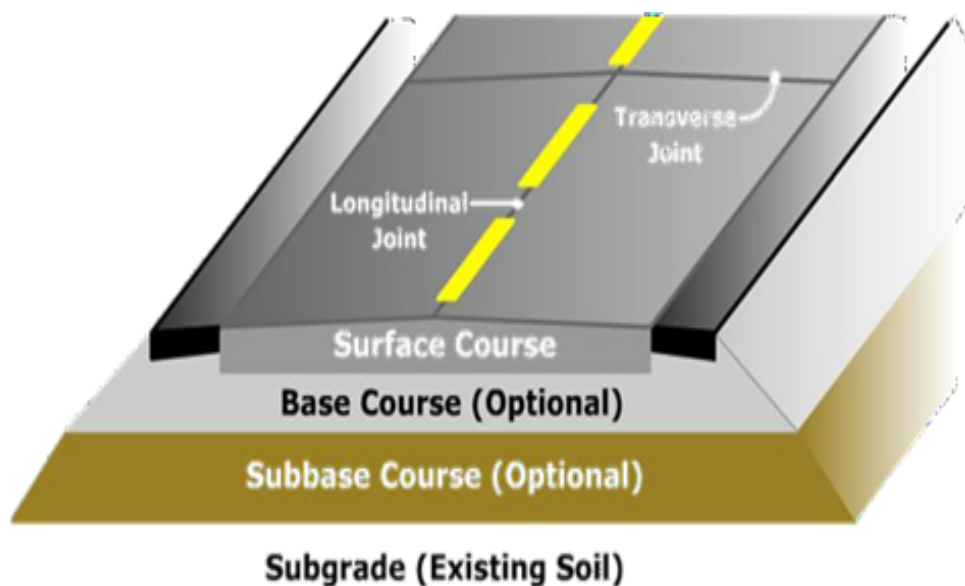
Cross-Sectional View of Typical Rigid Pavements [11].
